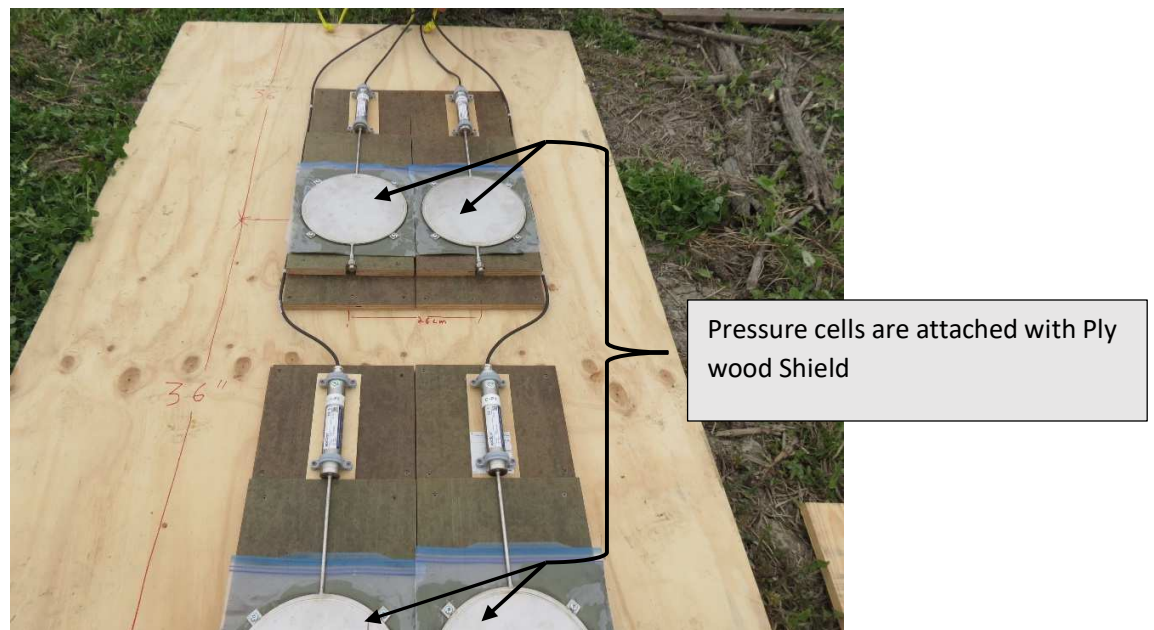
Pressures cells installation on the Plywood shield at the site before installations in the trench.
